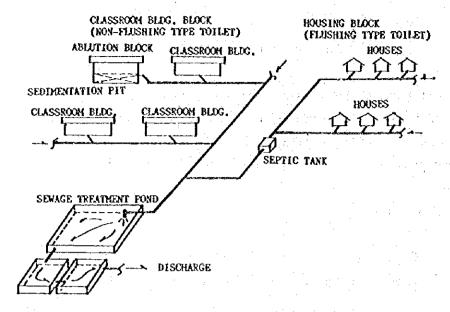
OUTDOOR SHWAGE TREATMENT SYSTEM
